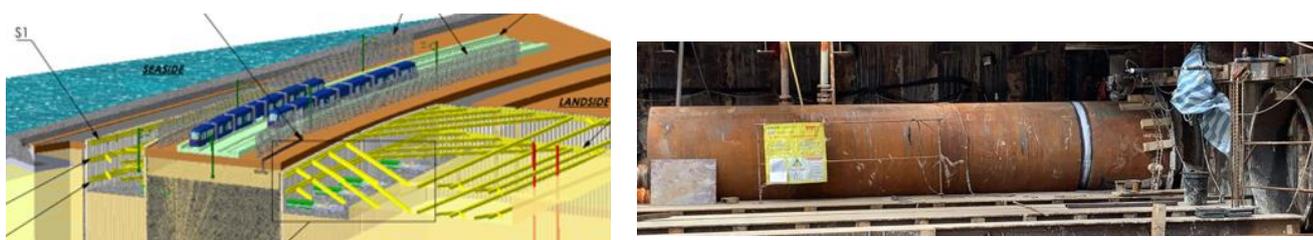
Installation of Canopy Tubes above Crown of Tunnel Boxes by micro TBM and pipe jacking
